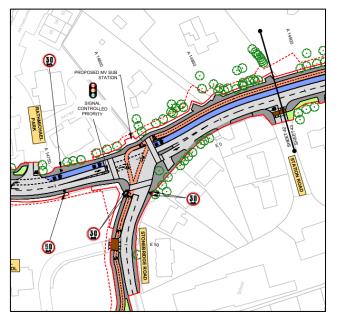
Extract from General Arrangement Drawings at Stonebridge Road / Dublin Road (Sheet 42)
